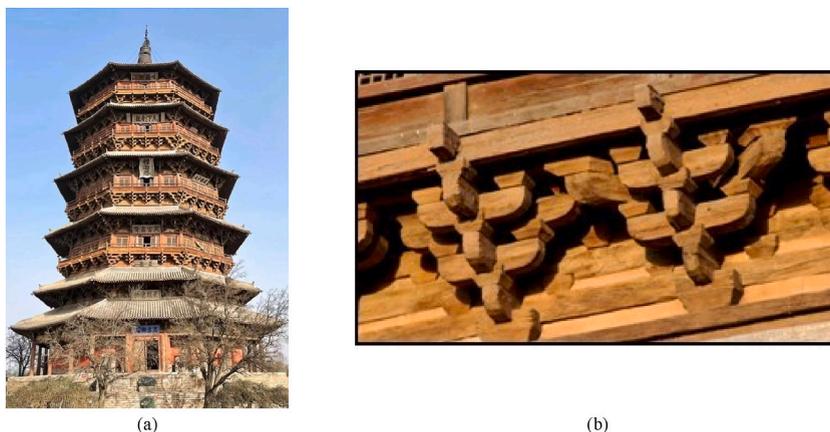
The tallest and oldest existing timber tower in China (a) Yingxian wooden pagoda, first built in 1056AD, and (b) its interlocking connection details [9].
